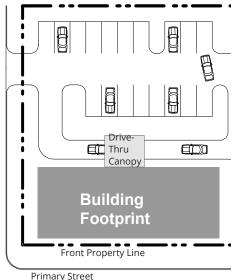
(6). Recommended Drive-Through Facility Layout.
